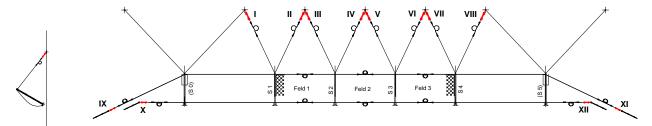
Building plan of the tested system with arrangement of load cells I-XII
